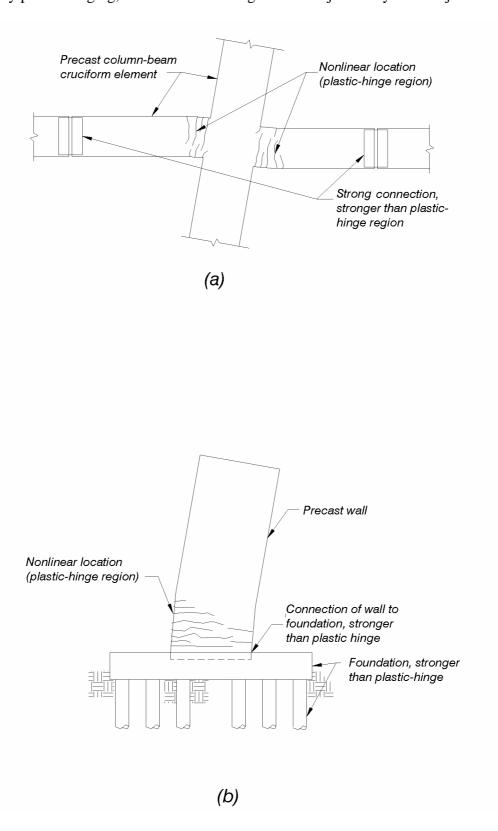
Examples of equivalent monolithic precast systems: (a) moment resisting frame, (b) structural wall
